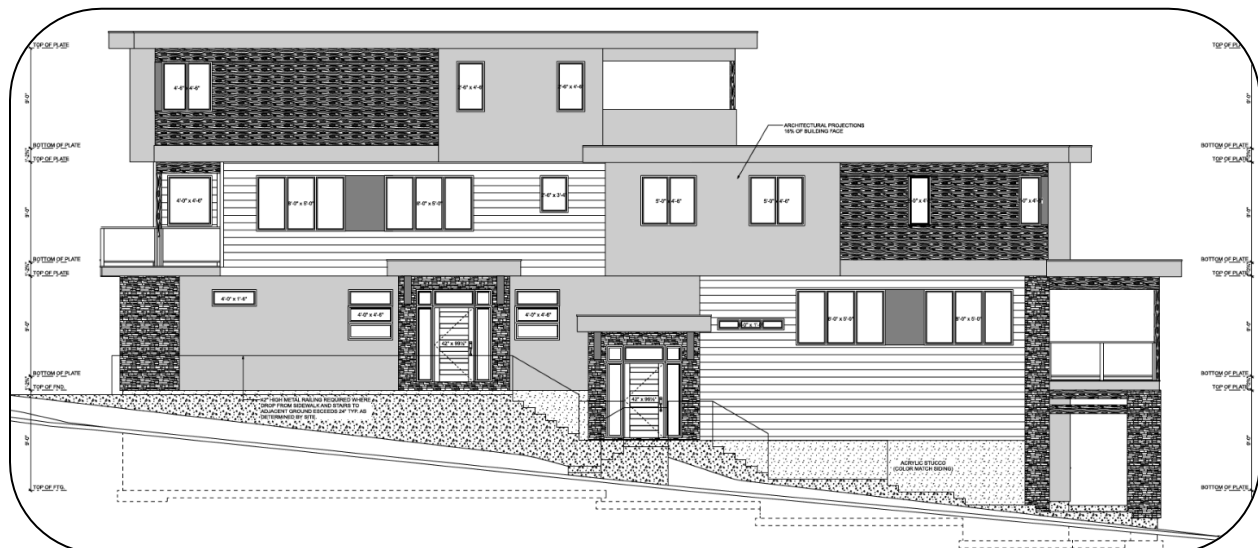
Side Elevation (Facing North to Vancouver Ave)
